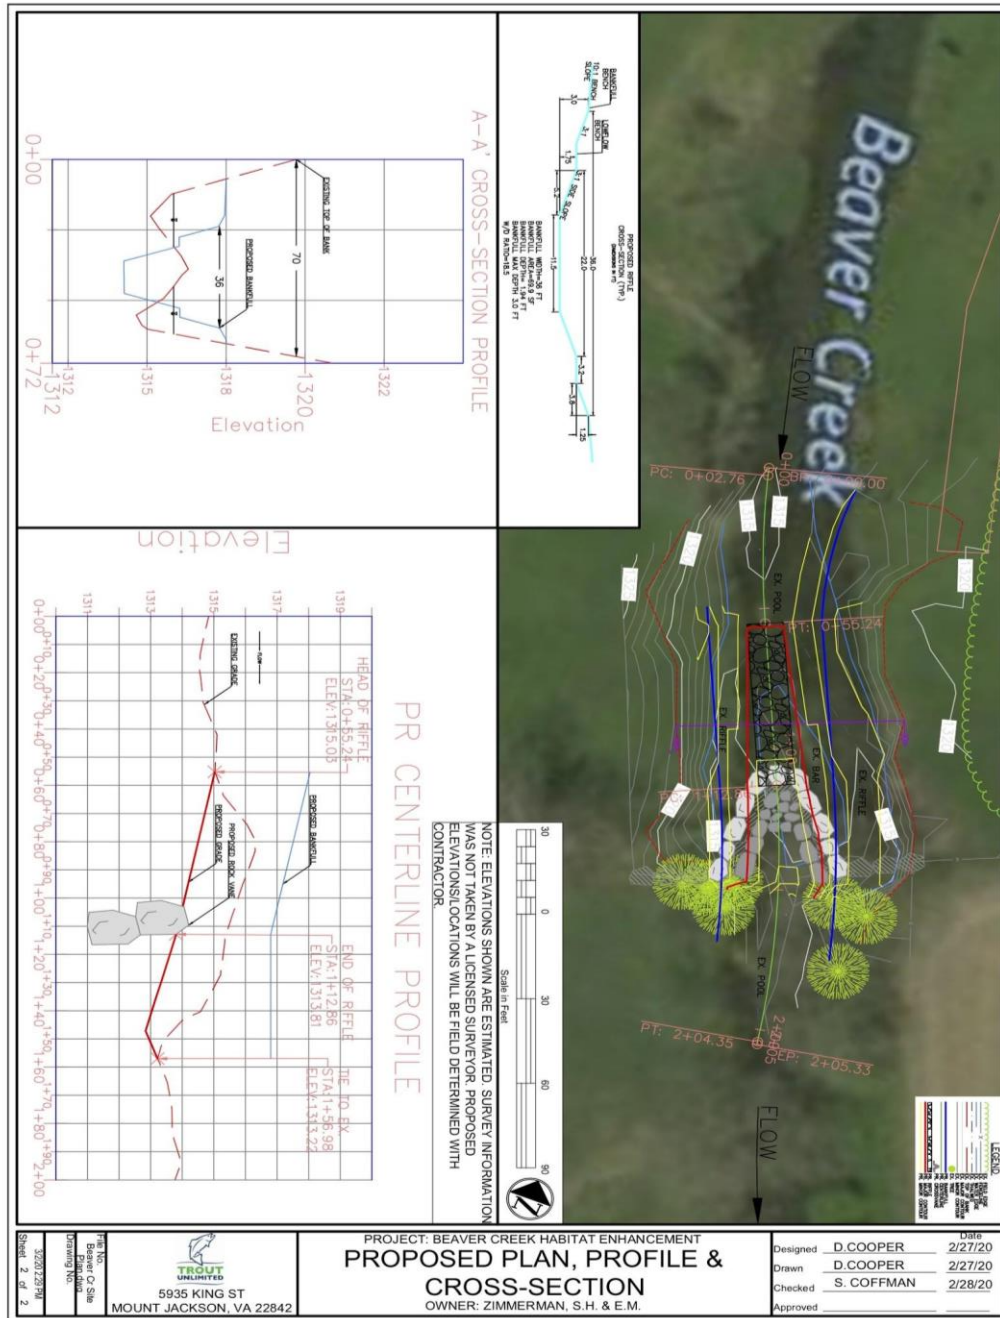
Full finalized plan, profile, and cross section for Beaver Creek Drawing by Dylan Cooper, Massanutten Chapter of Trout Unlimited
